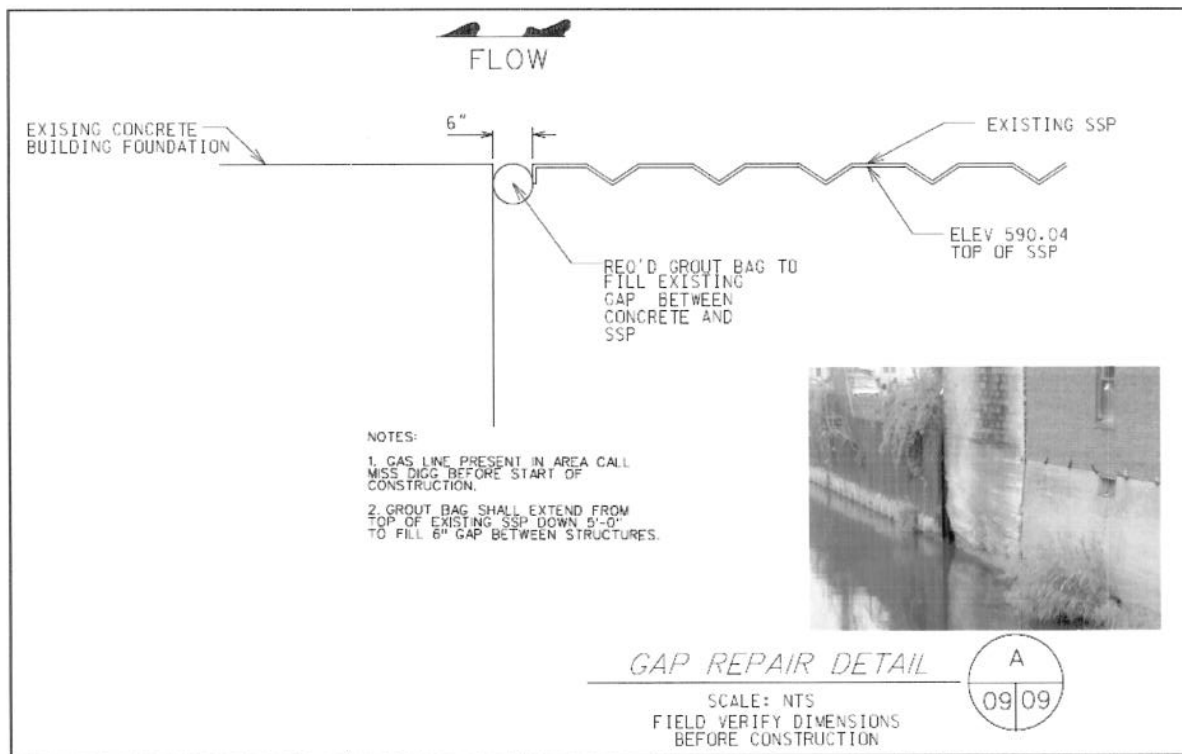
Detail for proposed gap repair between steel sheet pile wall and existing building (NTS).
